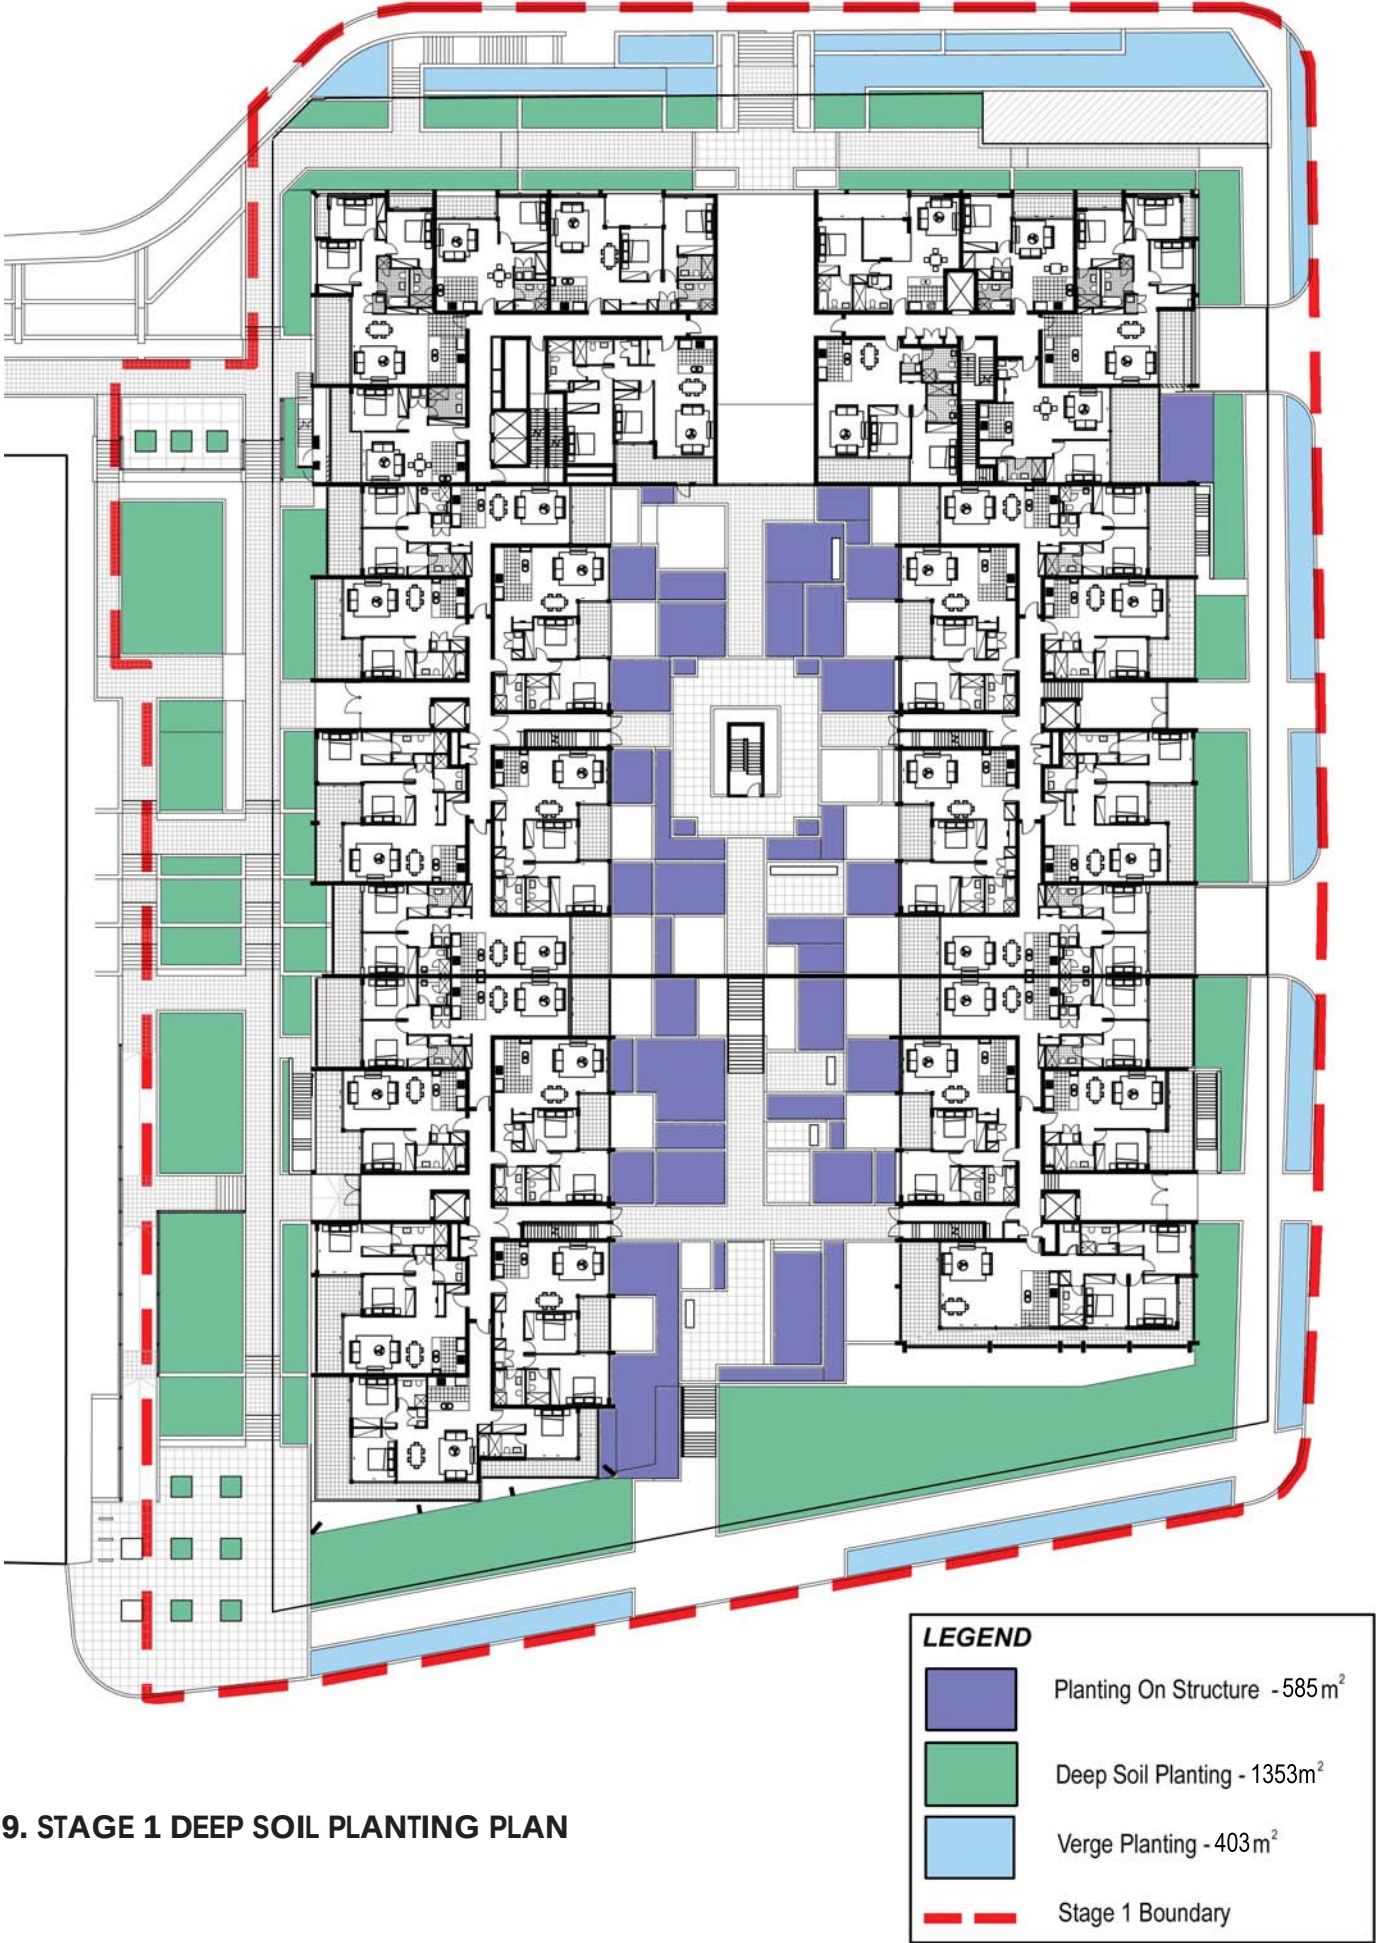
STAGE 1 DEEP SOIL PLANTING PLAN
